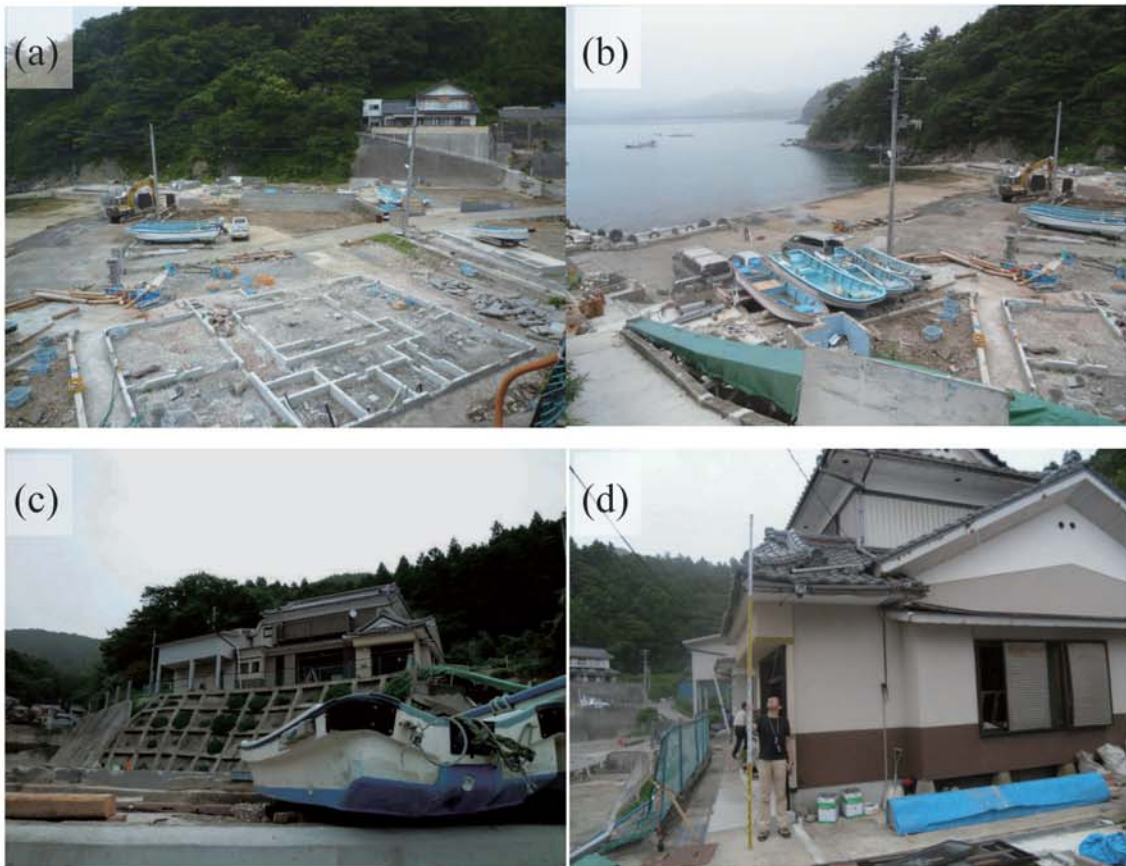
(a)-(c) Damage at Ogatsucho-Kuwanohama. (d) Tsunami trace survey point on the roof of Mr. Naganuma's house (3.20 m above ground level, M53).
